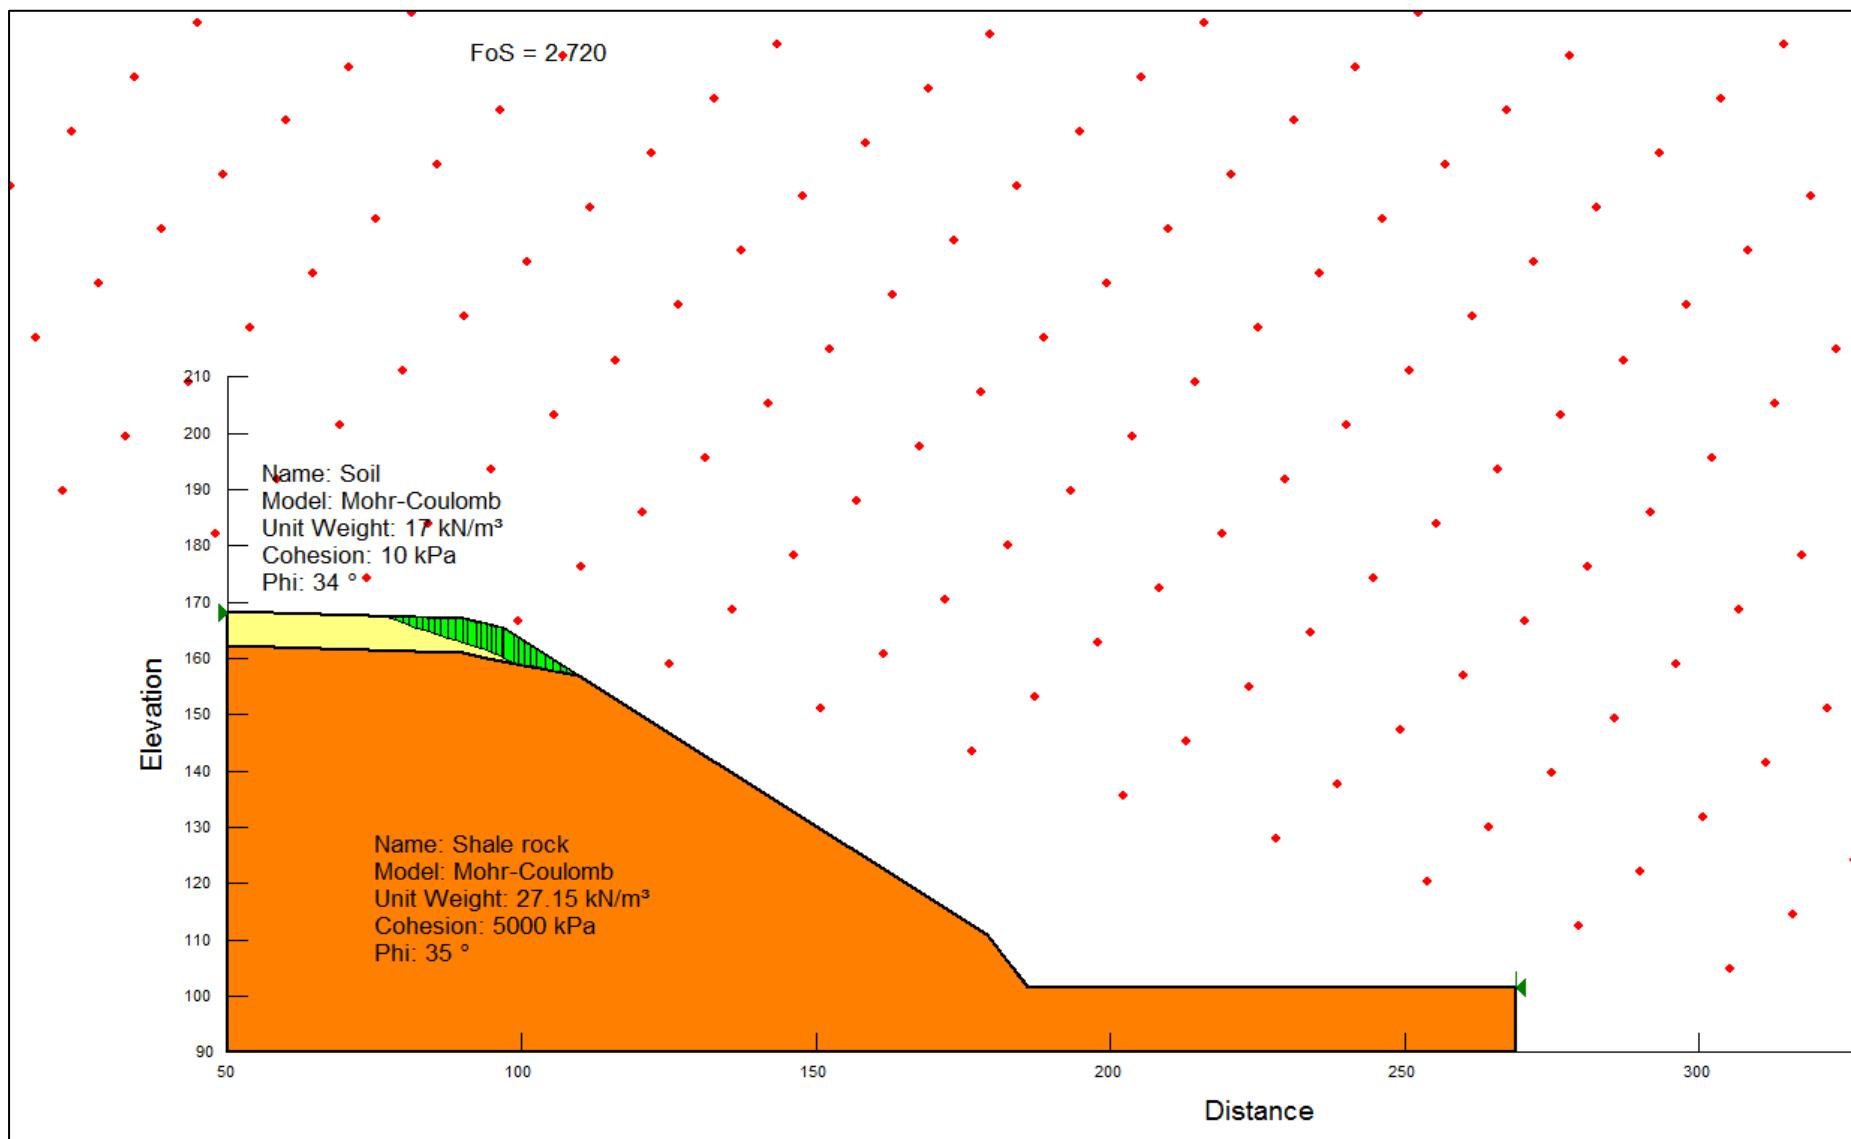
E.18: Outlet portal, Section 2, 1:1.5 excavation
